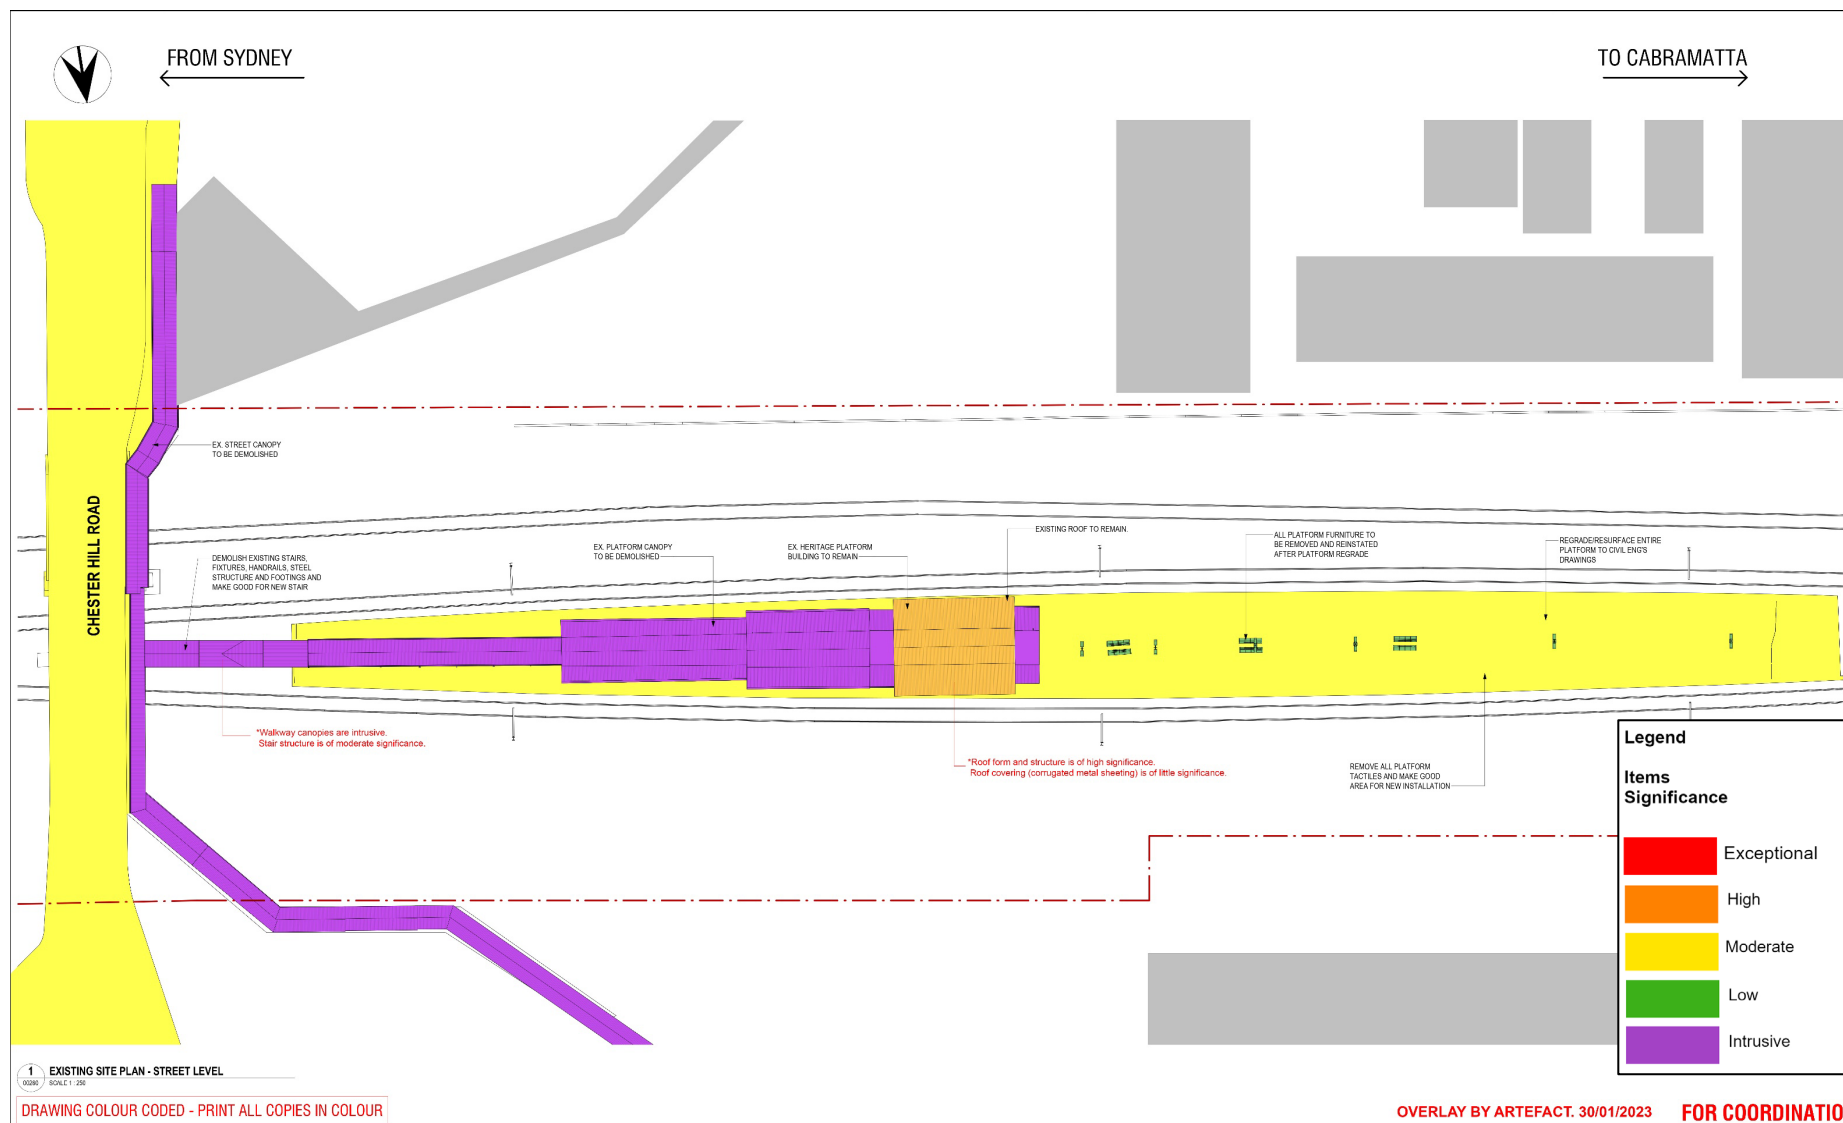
Grading of significance diagram – existing site plan, not to scale (Source: HDR [Design Inc with Artefact overlay]).
